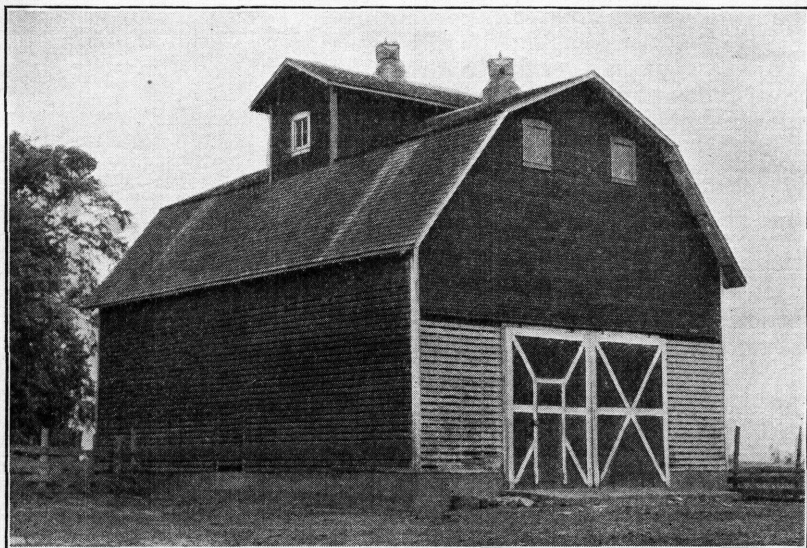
Gambrel-roof cornercrib and granary, with small section of tight sheathing below plate for storm protection
